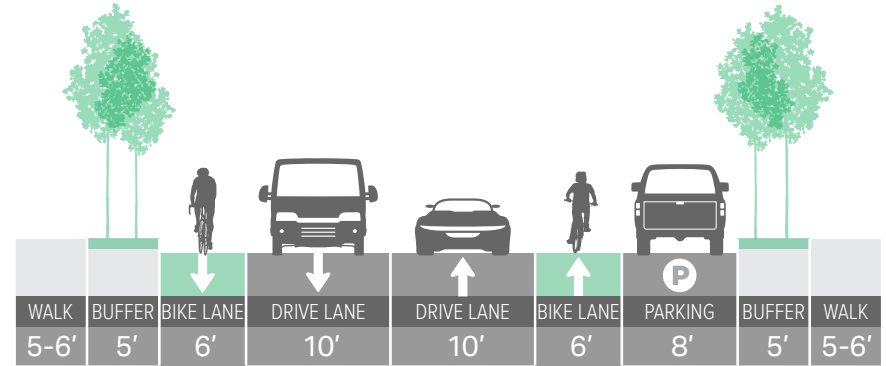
Proposed Cross-Section Dart Street to Winter Street
